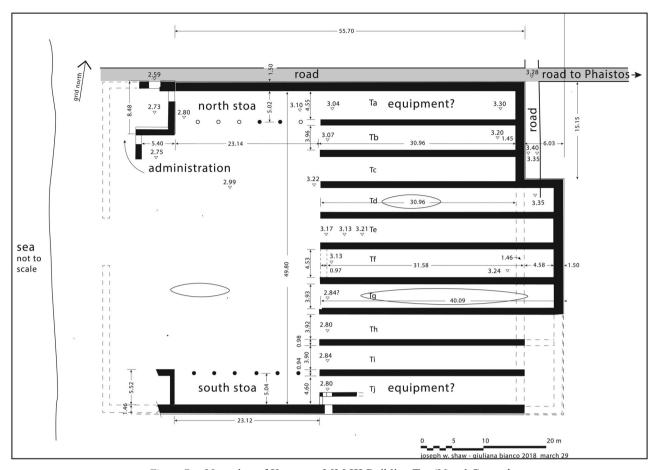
New plan of Kommos, MM III Building T, a 'Naval Centre.'
